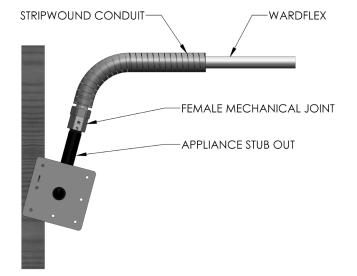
Appliance stub out with a WARDFlex[®]/ WARDFlex[®]MAX female mechanical fitting which can be installed in a concealed location. For this type of arrangement refer to section 4.4 on for protection details.
